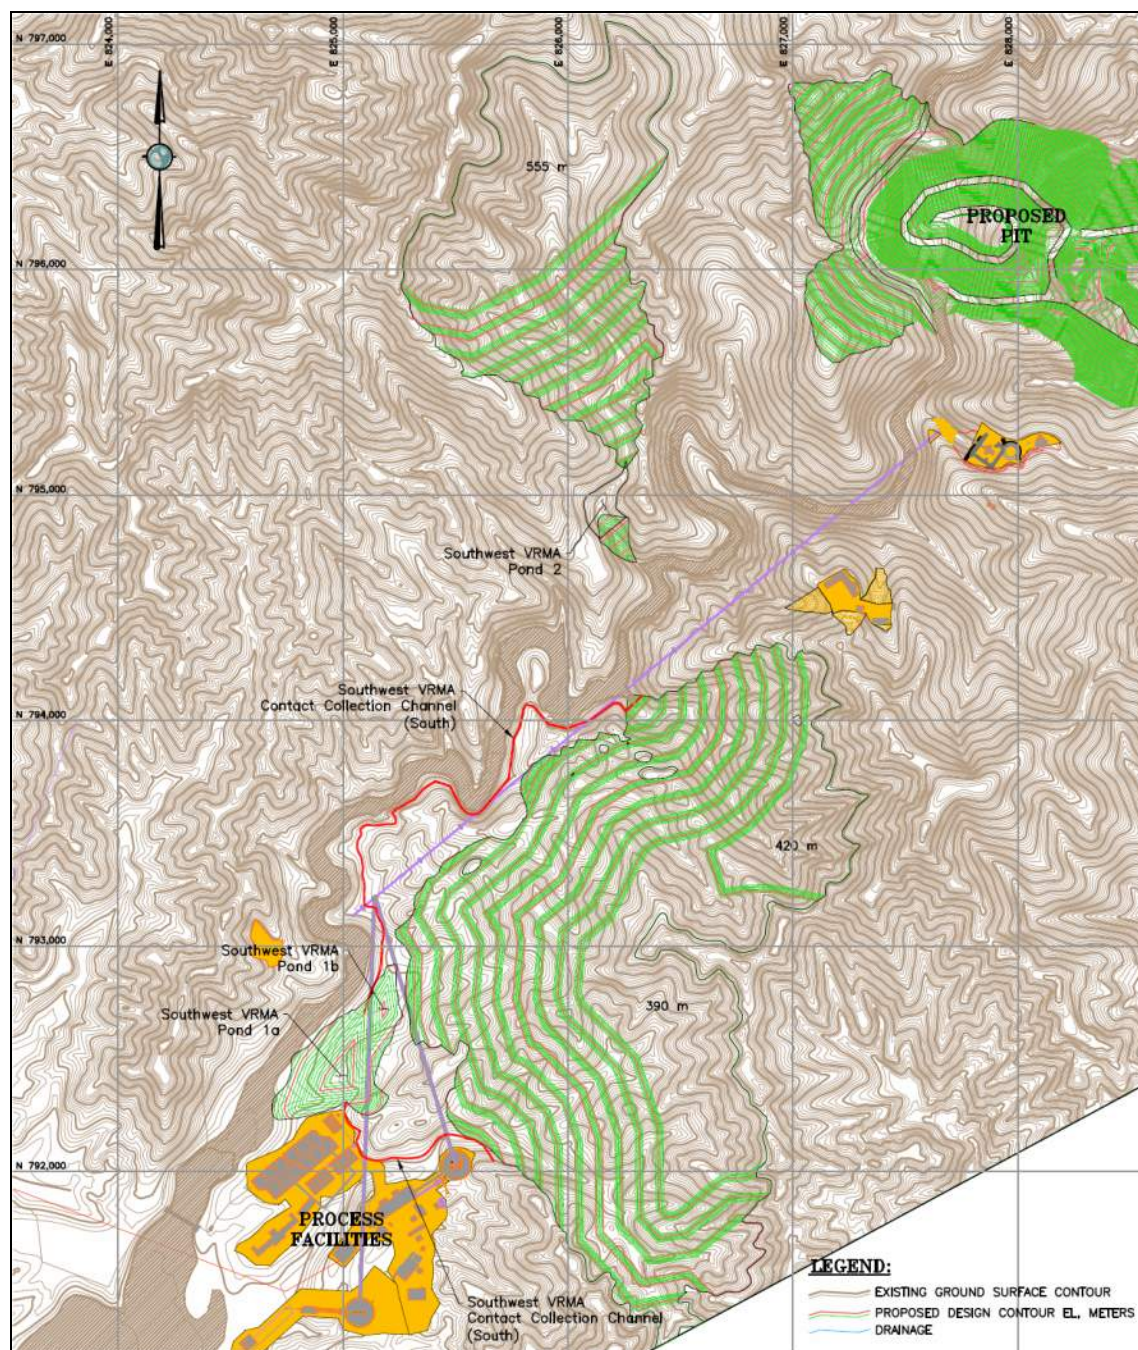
Proposed VRMA Ultimate Layout (M3, 2013)
